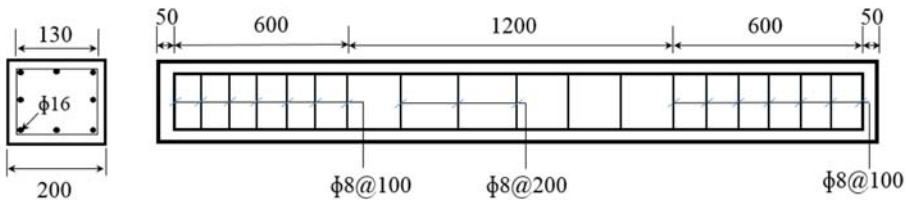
Dimension and reinforcement arrangement of UHPC and HSRC columns.
